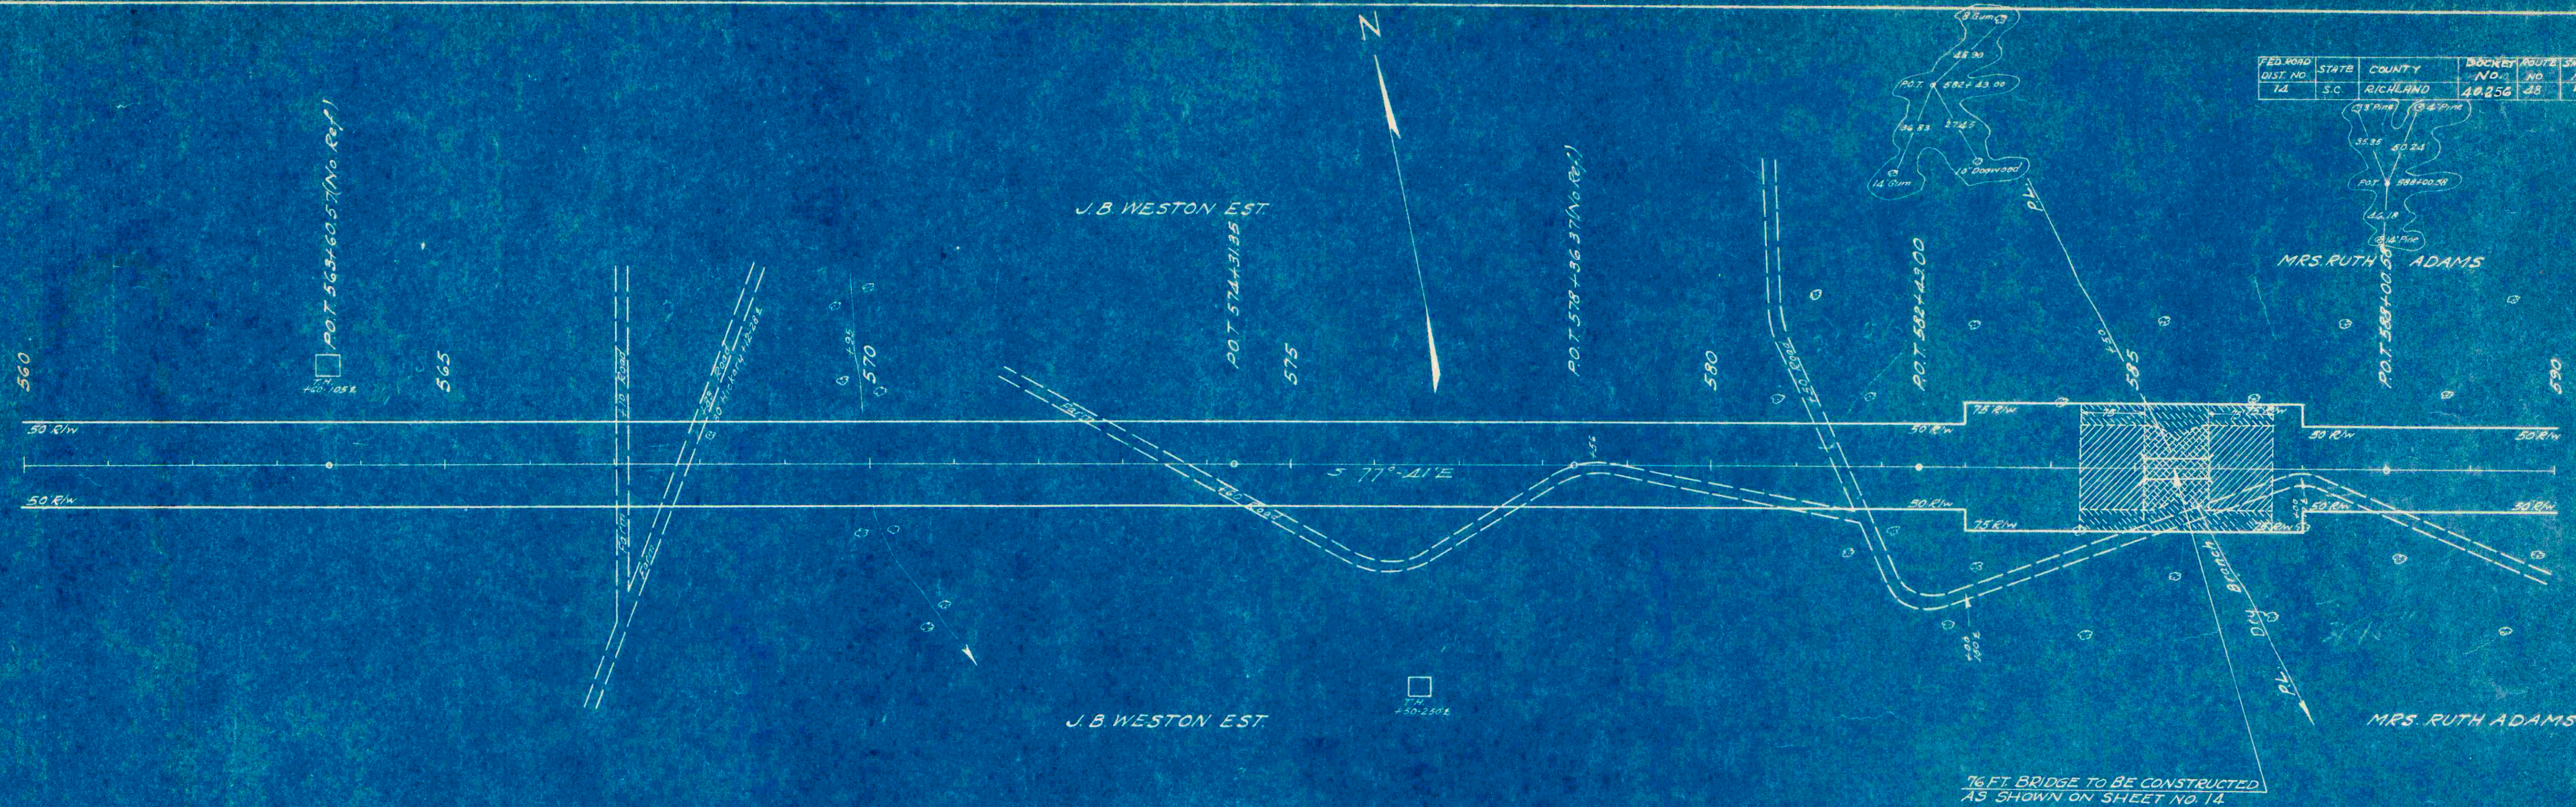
'-50' SPAN BRIDGE OVER CEDAR CREEK
